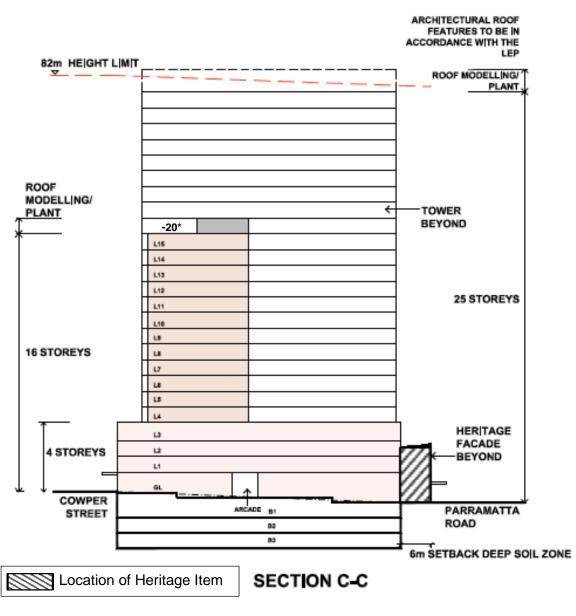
Building Envelope Section C-C<u>* final height of tower</u> to be determined through the Design Excellence process.
